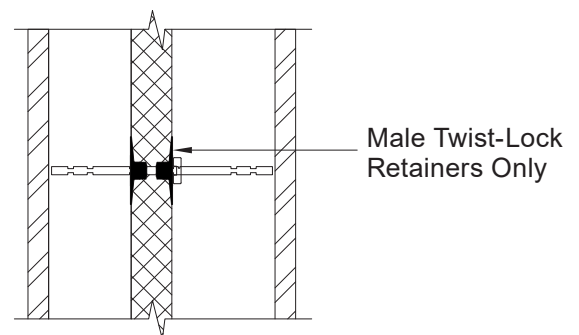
Cast-in-place male twist-lock retainers as placed within wall assembly. Note how connector notches line up with shape of retainer wall when retainers are properly installed
